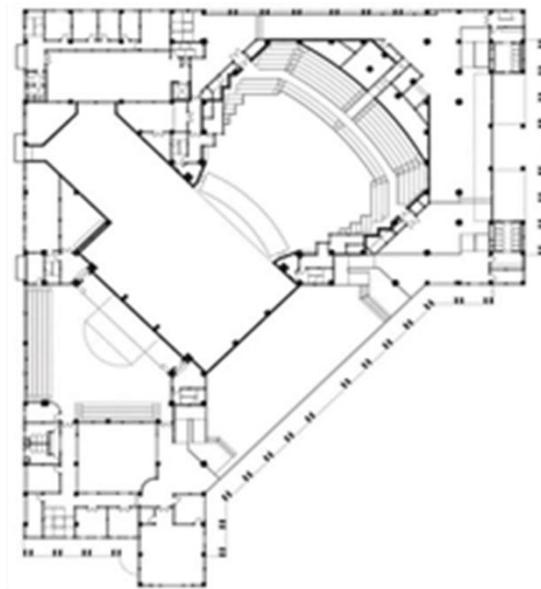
Second floor plan of the Centennial Memorial Hall. Source: Qi Zhang Architectural Design Studio
